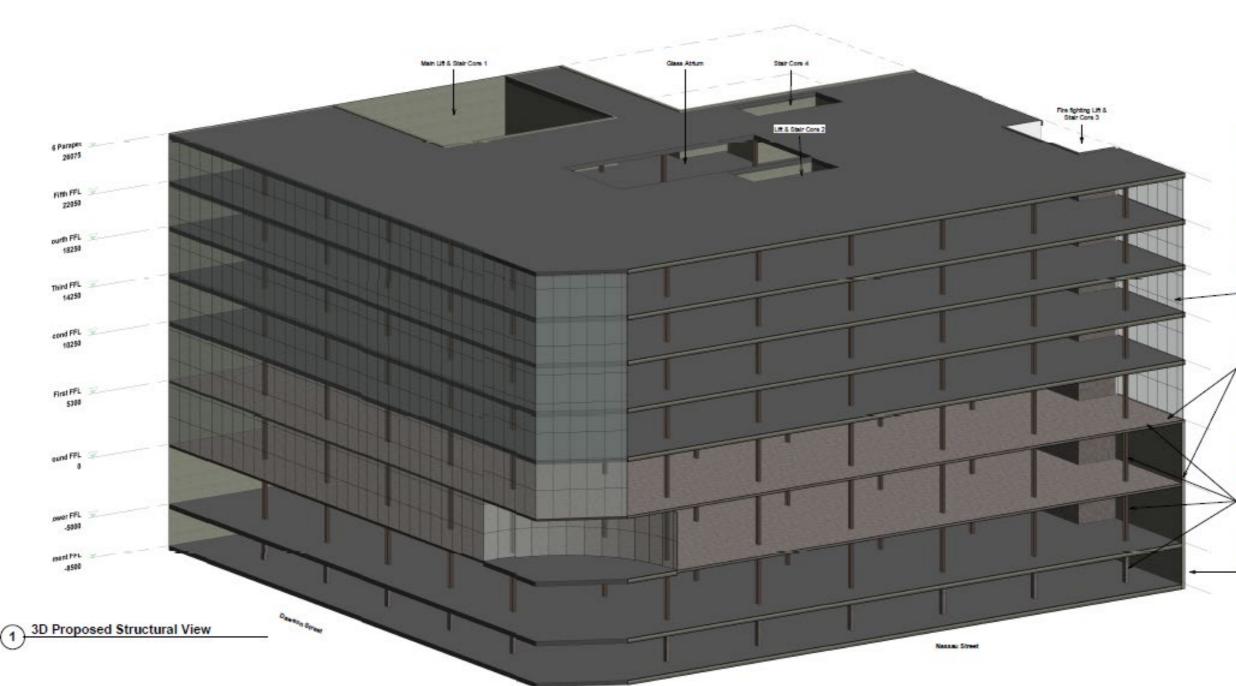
Proposed Structural Composition of building (Assumptions based on Engineers Reports).
